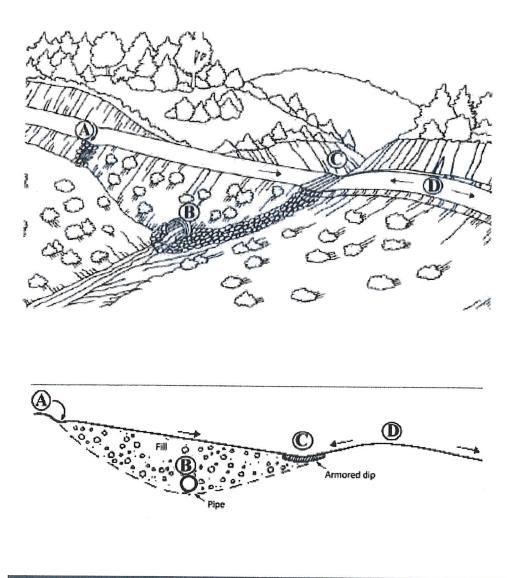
Critical dips of dipped crossing fills should be centered near a stream crossing's down-road hingeline, not over the centerline of the crossing where overtopping could cause washout or severe erosion of the fill if the stream crossing culvert (B) plugs, water will pond behind the fill until reaching the critical dip or low point in the crossing (C) and flowing back down into the natural stream channel. The down-road ditch must be plugged to prevent streamflow from diverting down the ditch line. For extra protection in this sketch, fiprap almor has been placed at the critical dip outfall and extending downslope to the stream channel. This is only required or suggested on stream crossings where the culvert is highly likely to plug and the crossing fill overtopped. The dip at the hinge line is usually sufficient to limit erosional damage during an overtopping event. Road surface and ditch runoff is disconnected from the stream crossing by installing a rolling dip and ditch relief culvert just up-road from the crossing (A) (Keller and Sherar, 2003).
